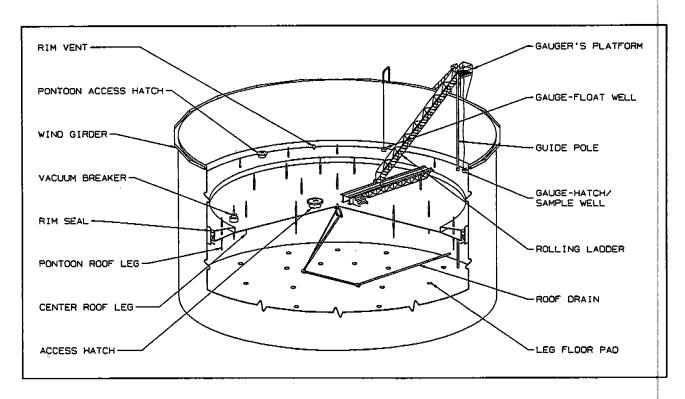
Typical External Floating-Roof Tank (EFRT) With a Pontoon Floating Roof
